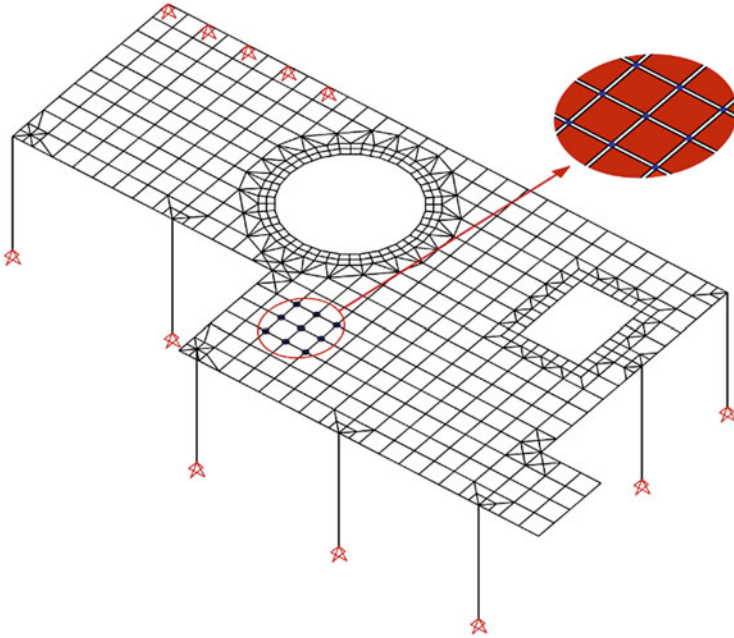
Most gravity loads (permanent and variable as defined in Sect. 2.3.1.4) and all seismic inertial loads (assuming mass properties are lumped in one or more locations on each slab) are acting upon the floor slabs. Therefore, floor slabs in r/c building structures perform a dual function (see also Fig. 2.23):
